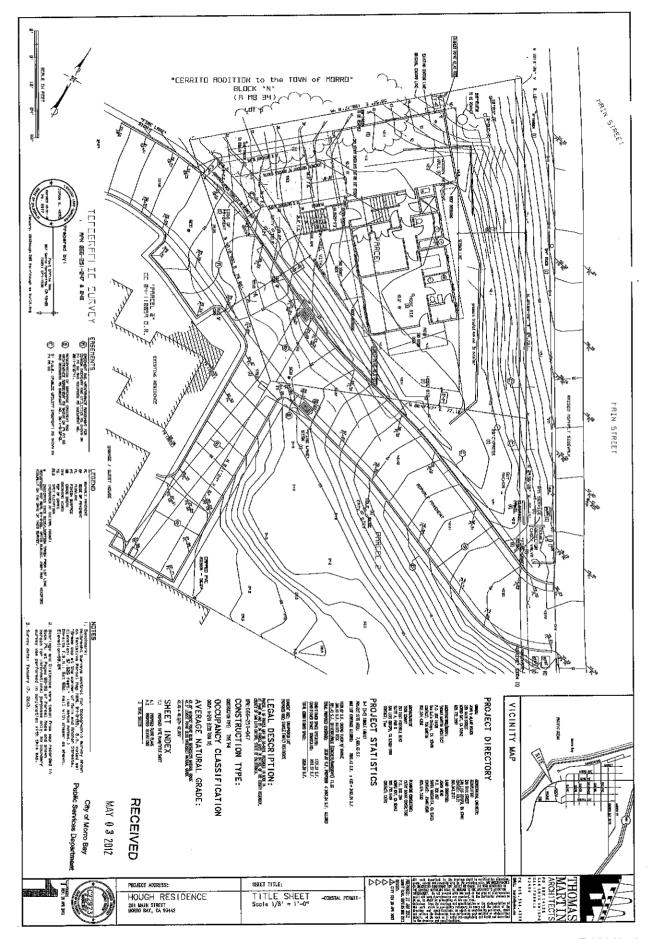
A-3-MRB-12-026 (Hough) Approved Project Site Plan Page 1 of 1
